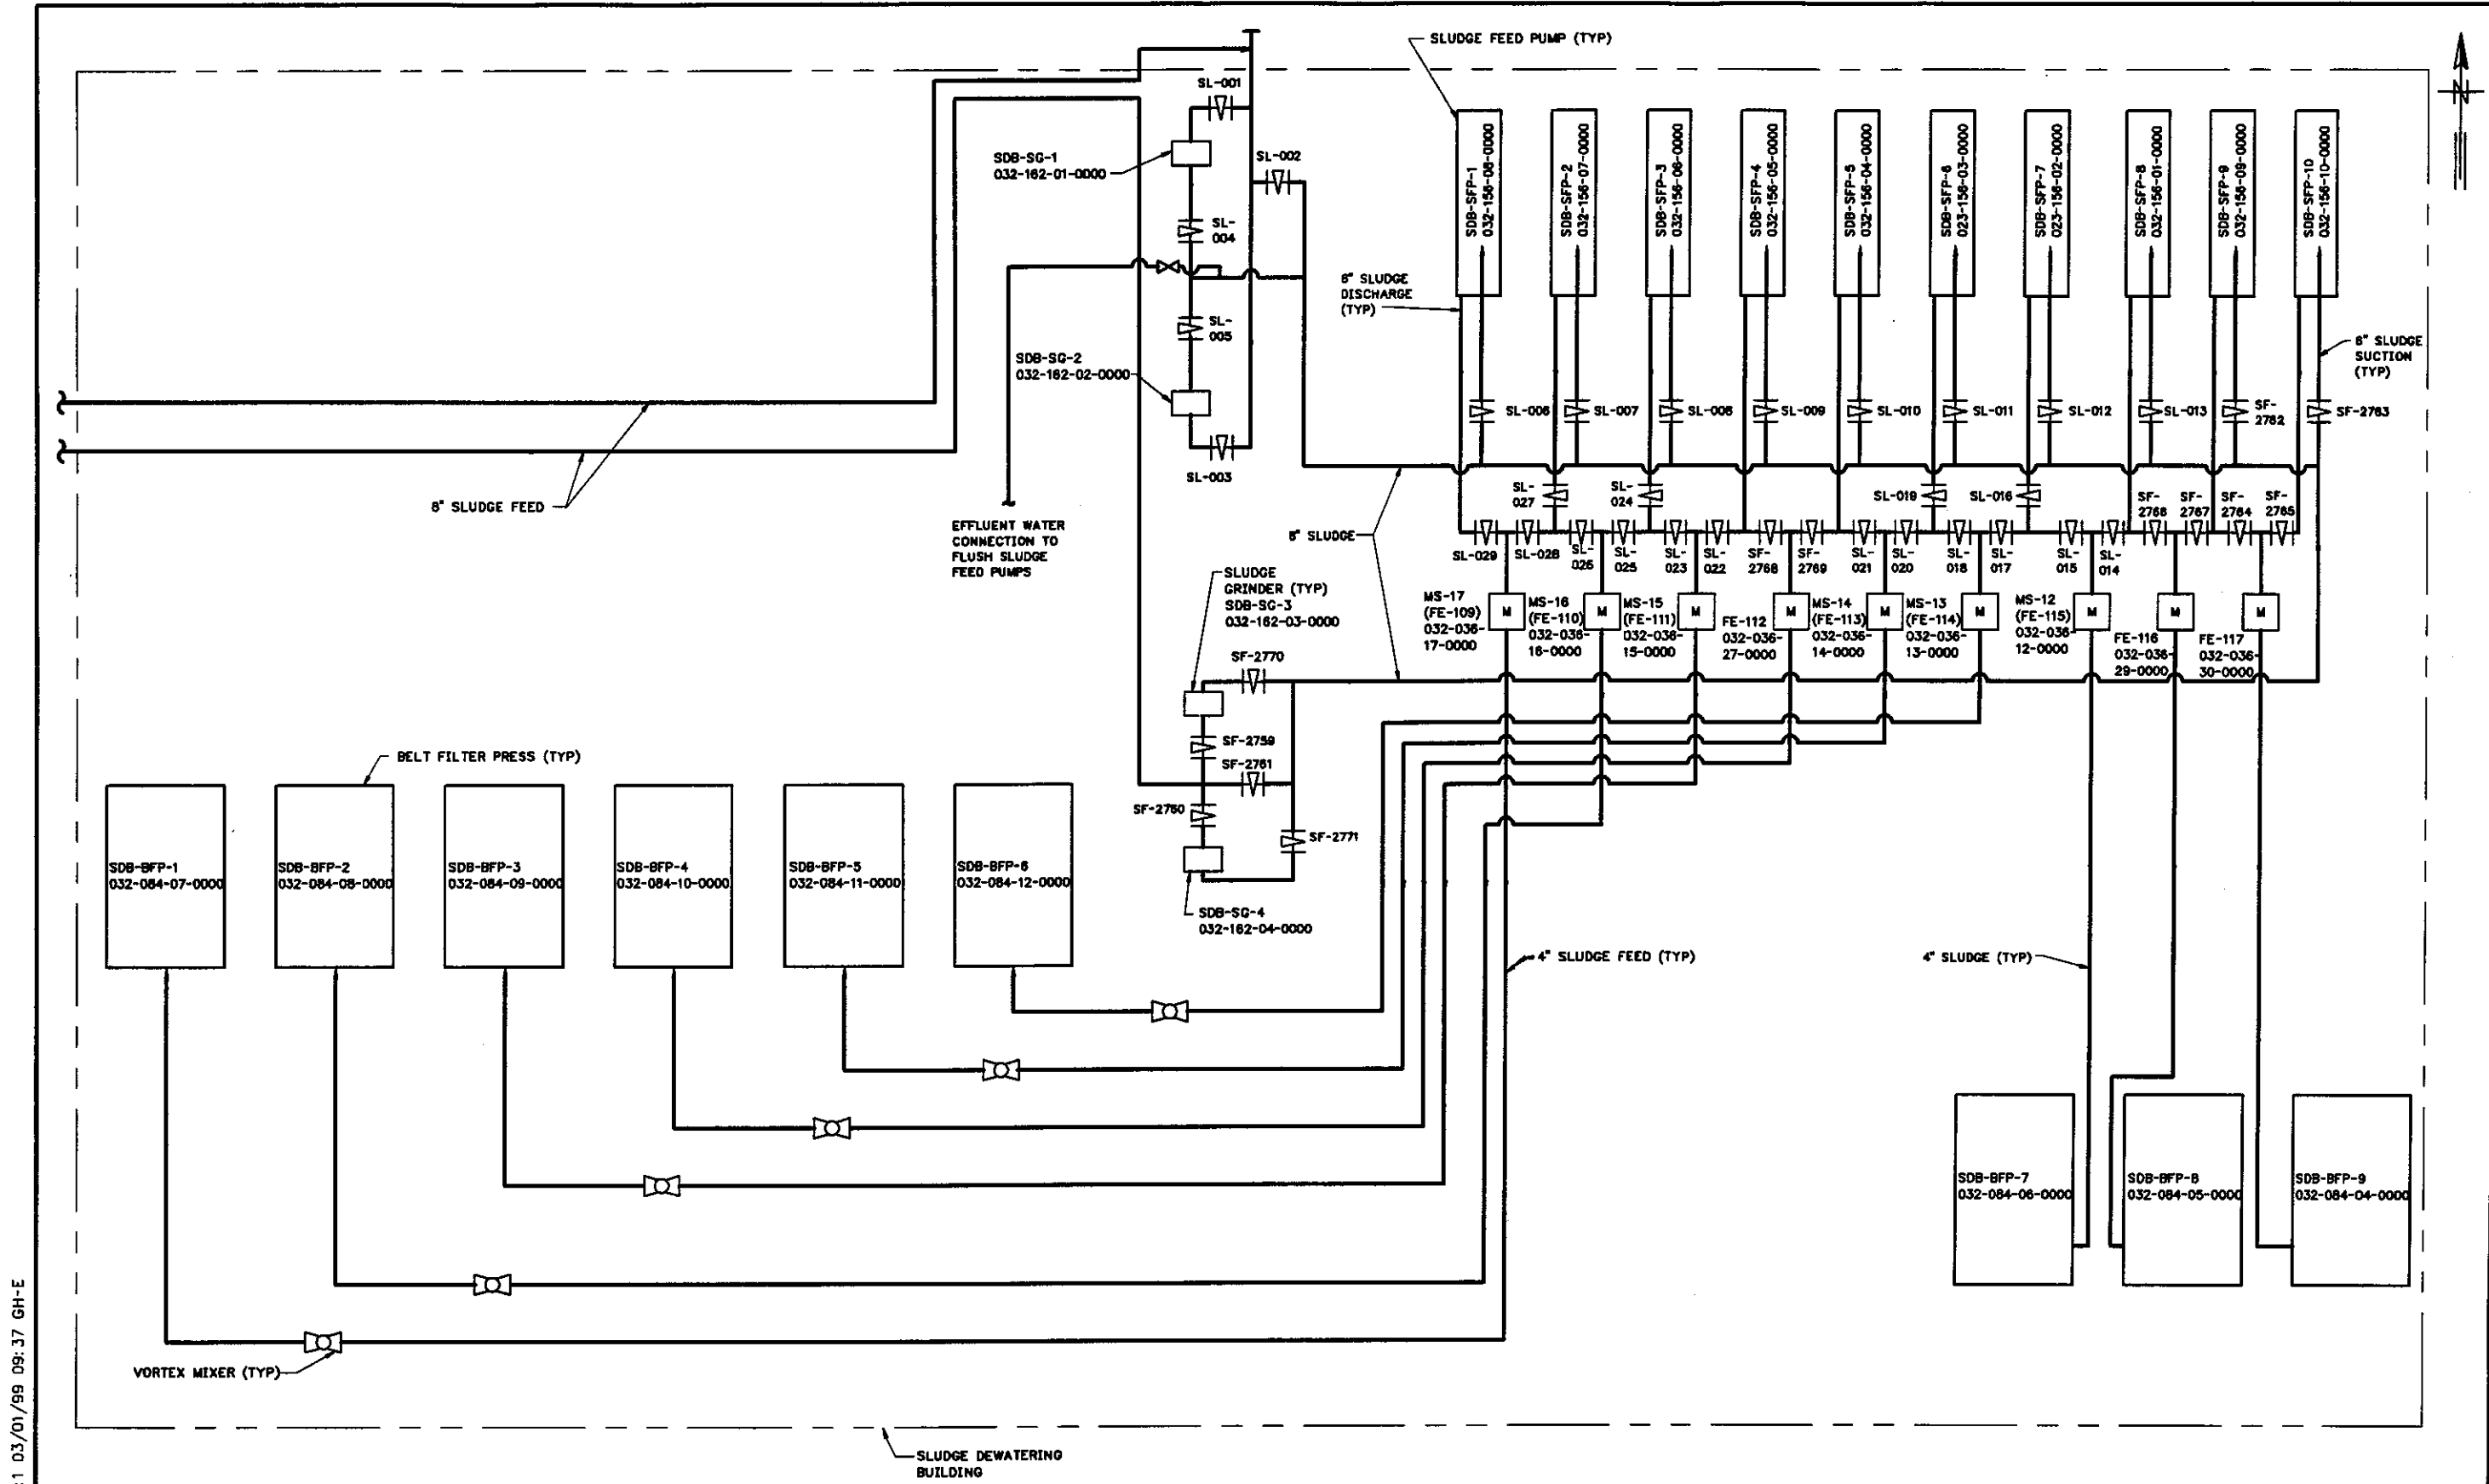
FIGURE III-SD-SDB-1 SLUDGE DEWATERING BUILDING SLUDGE FEED DIAGRAM
